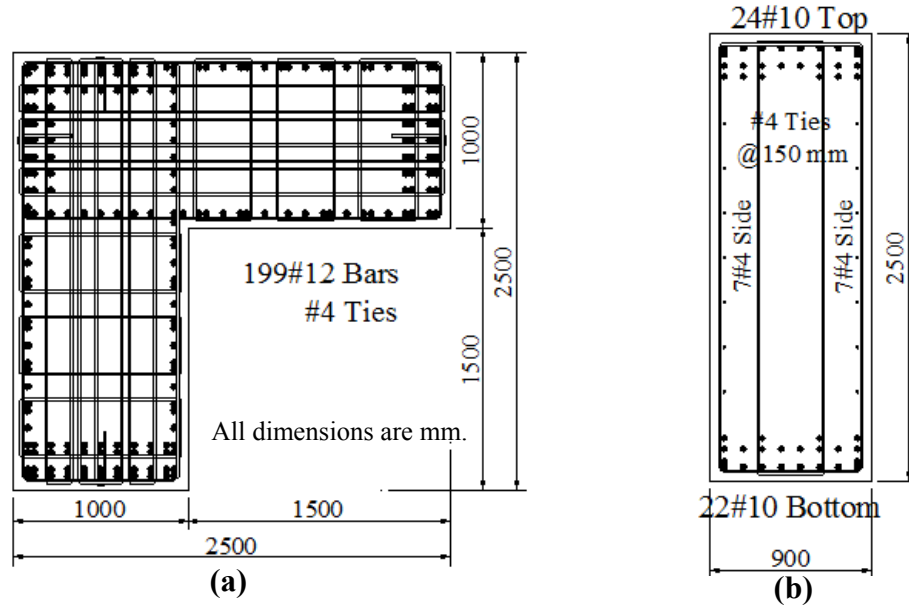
Cross Section Details of Clinker Preheat Tower: (a) First Storey Column; (b) First Storey Beam
